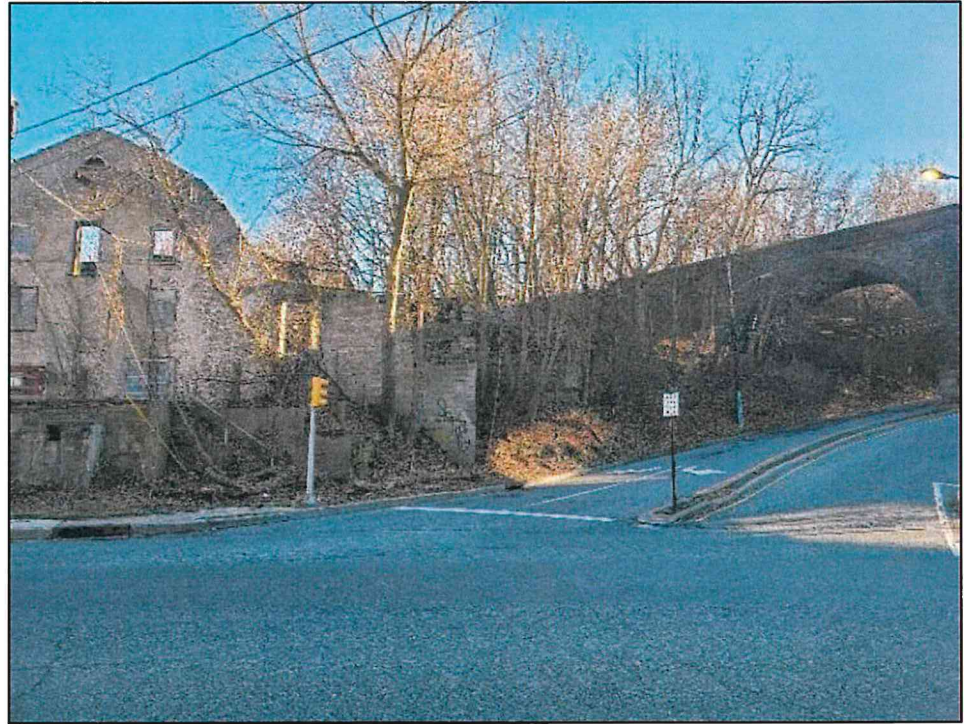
Typical at-grade view of the subject property's "Ice House. Note the vegetation and dilapidated state of the structure.
